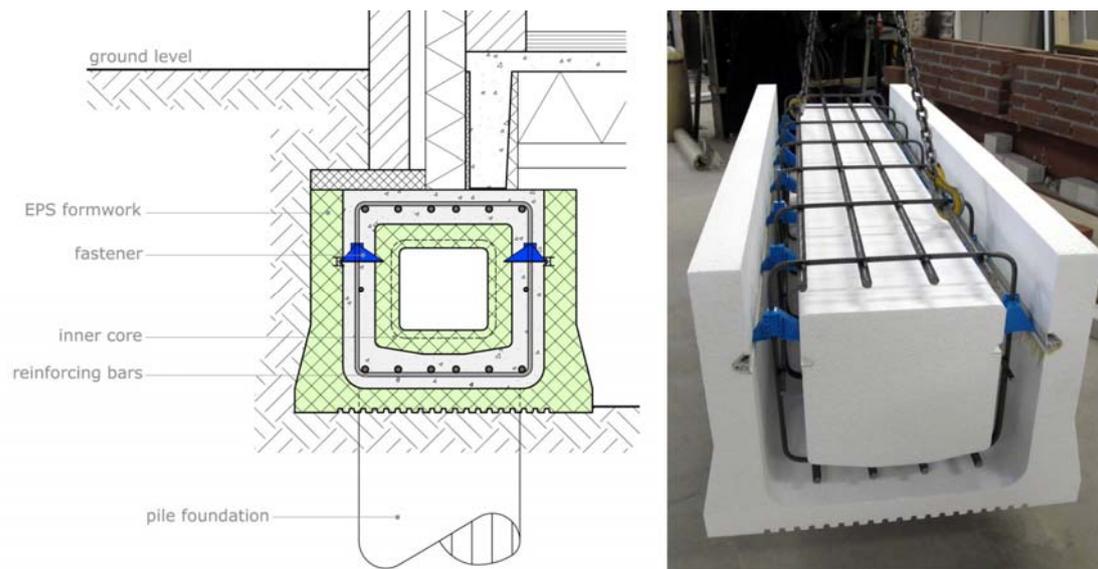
Schematic illustration of the B-smart foundation system [7] (left) and assembled formwork segment (right)
